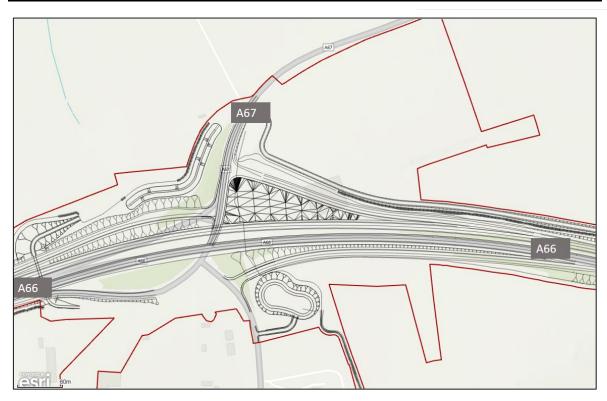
A66/A67 Bowes Proposed Junction Layout
